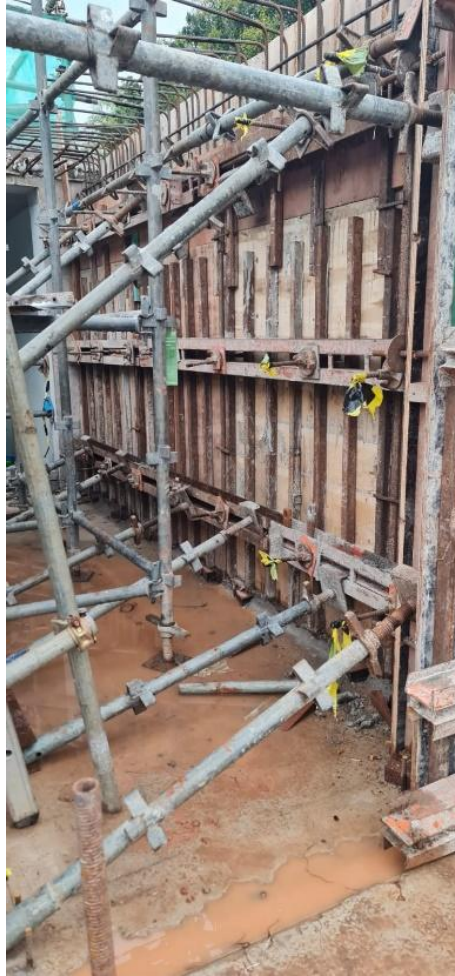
Exterior Non Modular Semi System Formwork wall 1
